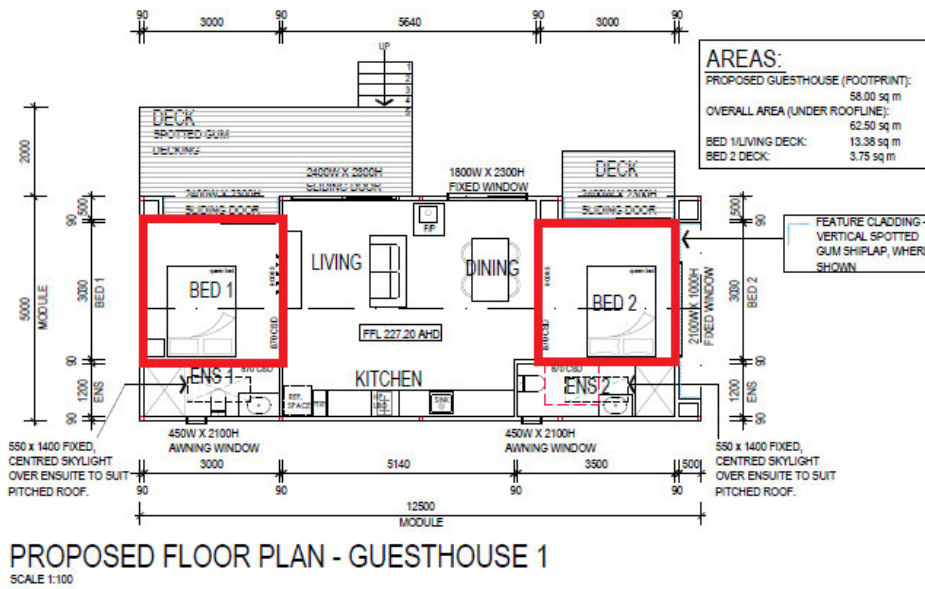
Guesthouse floor plan – bedrooms shown in red.
